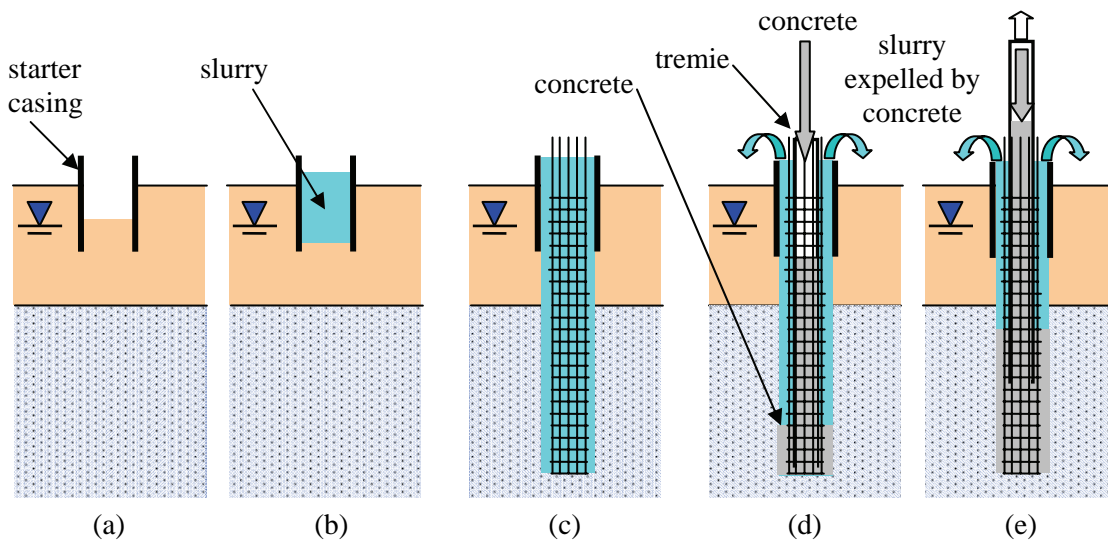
Slurry Drilling Process: (a) set starter casing; (b) fill with slurry; (c) complete and clean excavation, set reinforcing; (d) place concrete through tremie; (e) pull tremie while adding concrete
